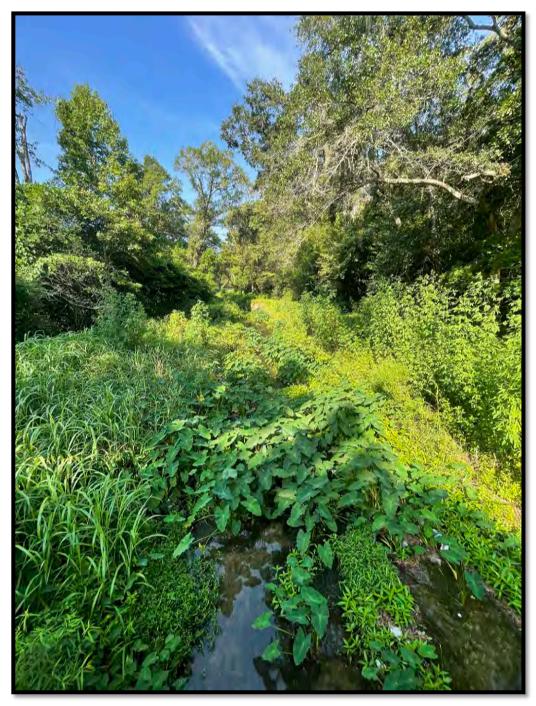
Photo of East Ditch at Texas Street Crossing (2023)
